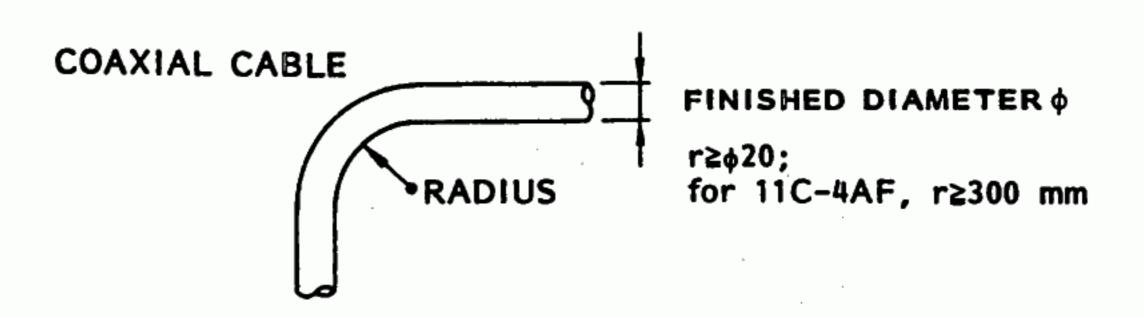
Bending Coaxial Cable (Class 11C-4AF)
